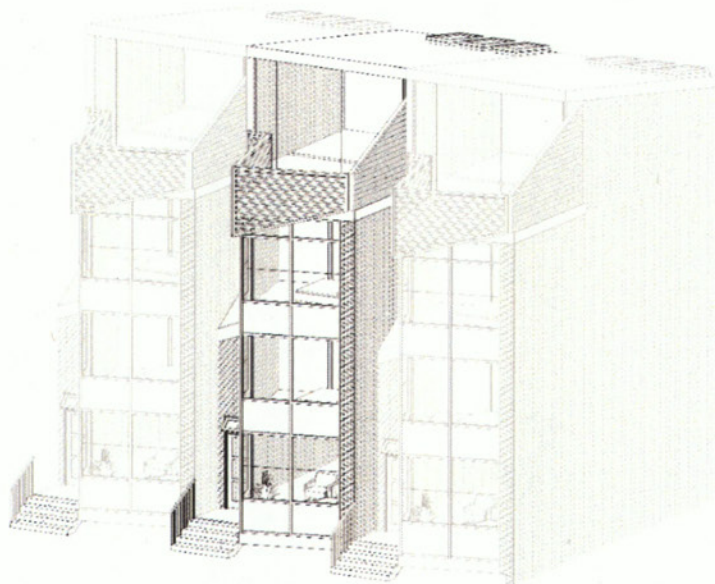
Balcony railing is built up between adjacent apartments to create a partial screening wall between units.
